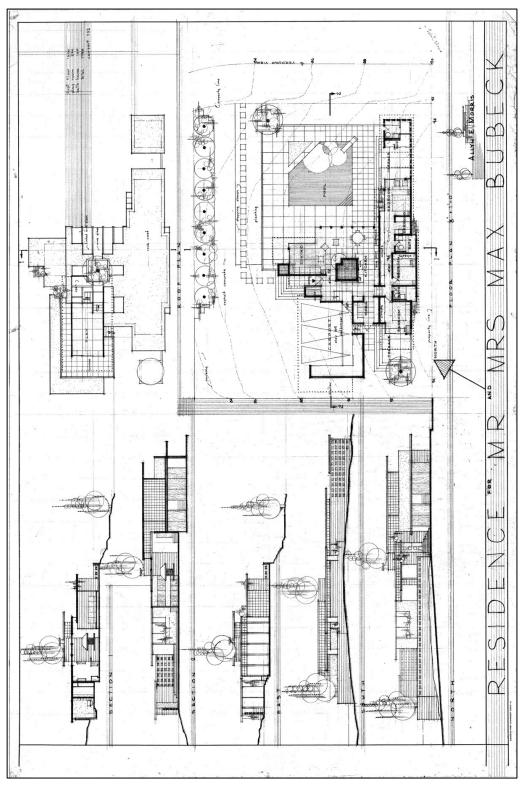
Bubeck Residence Site Plan, Elevations and Sections, Allyn E. Morris, Architect. Undated. © Howard Morris
